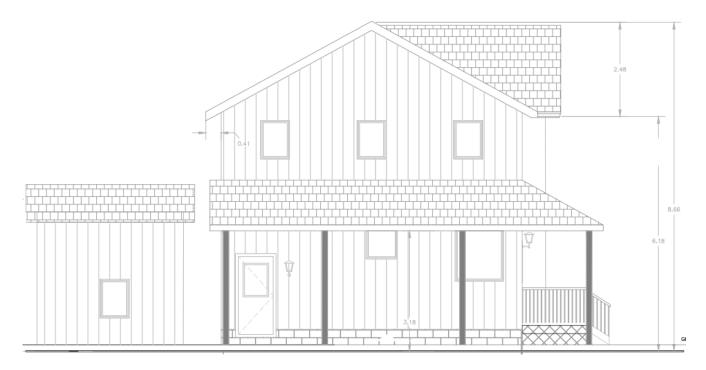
Proposed South Elevation, 40 Peter Street South. (*Image from client.*)
